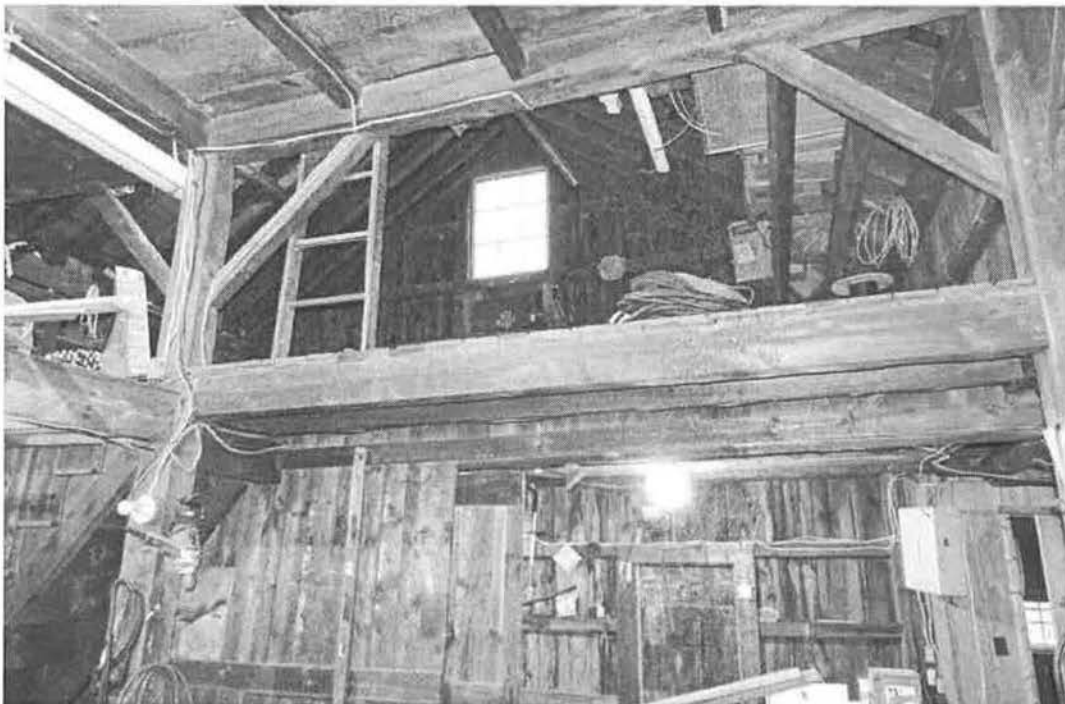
Main barn, center bay. View north into second floor and mow, Dec. 2015.
